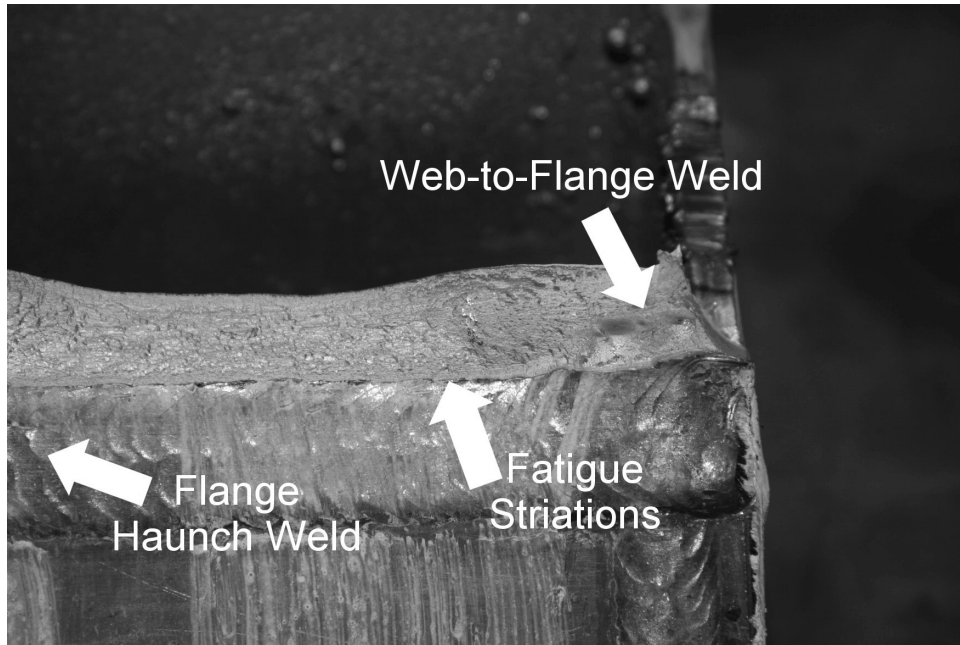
Fracture Surface of Bottom East Flange of Specimen X3L2.1
